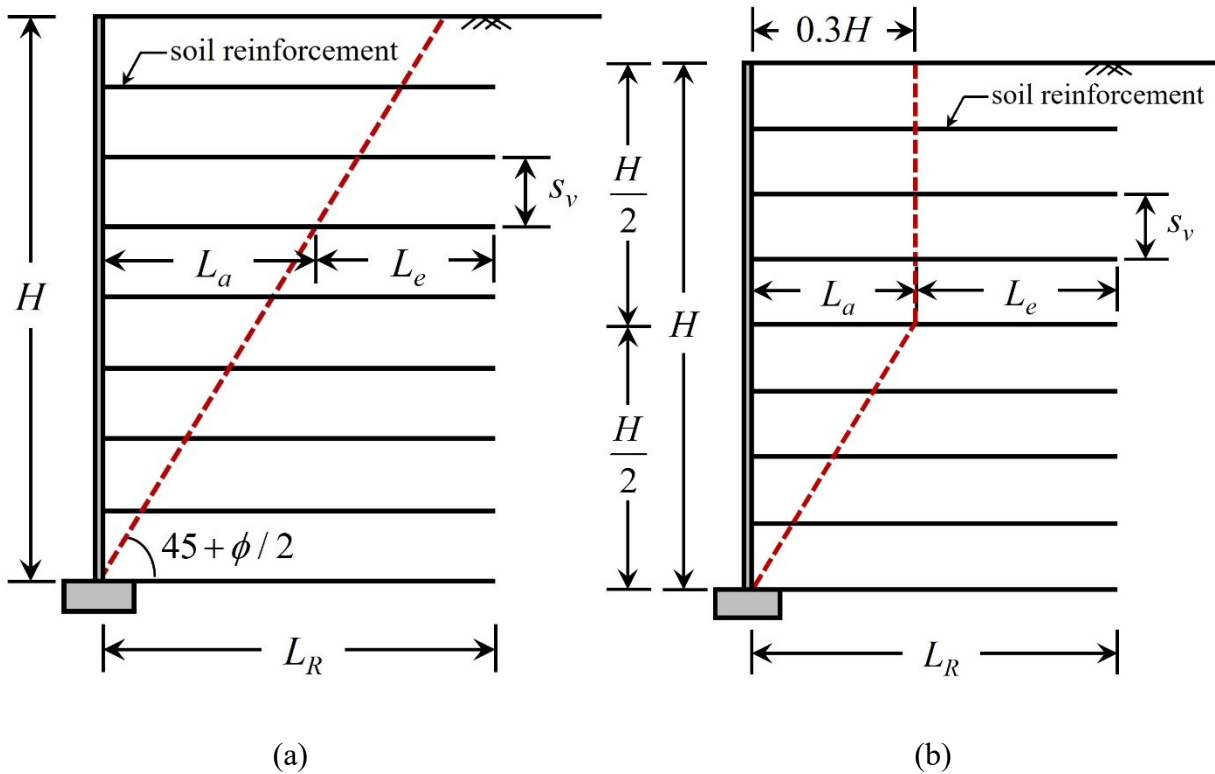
Failure surface for internal stability design of MSE walls with (a) inextensible reinforcements and (b) extensible reinforcements (adapted from FHWA, 2009b)
